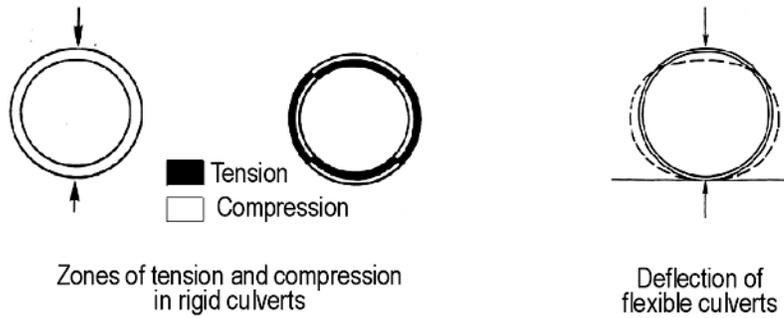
Load carrying behavior of rigid and flexible culverts (after Ballinger and Drake, 1995)
